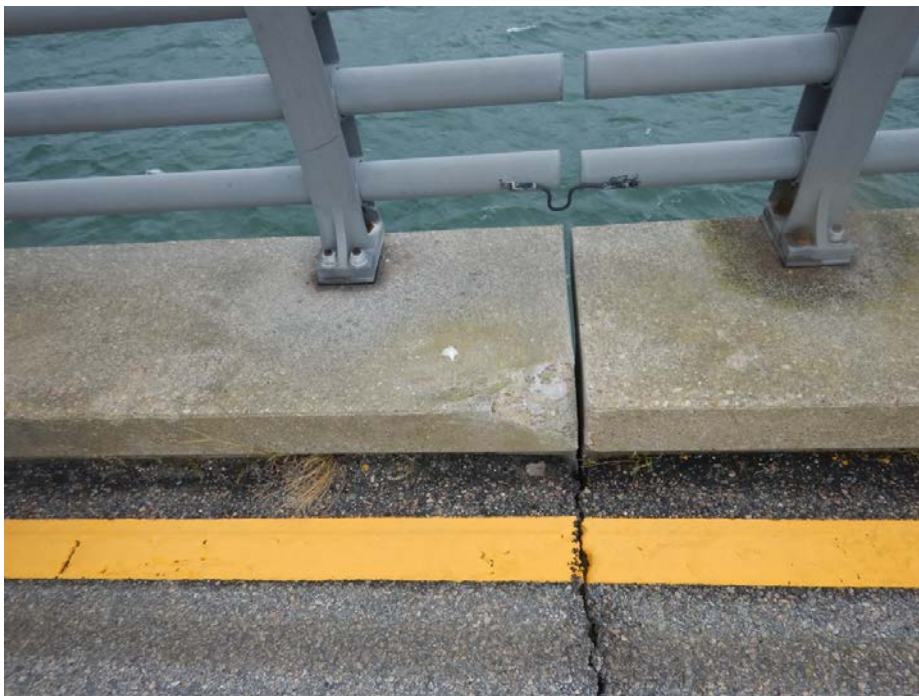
CNB178 Metal Bridge Railing - Failed Curb Repair
